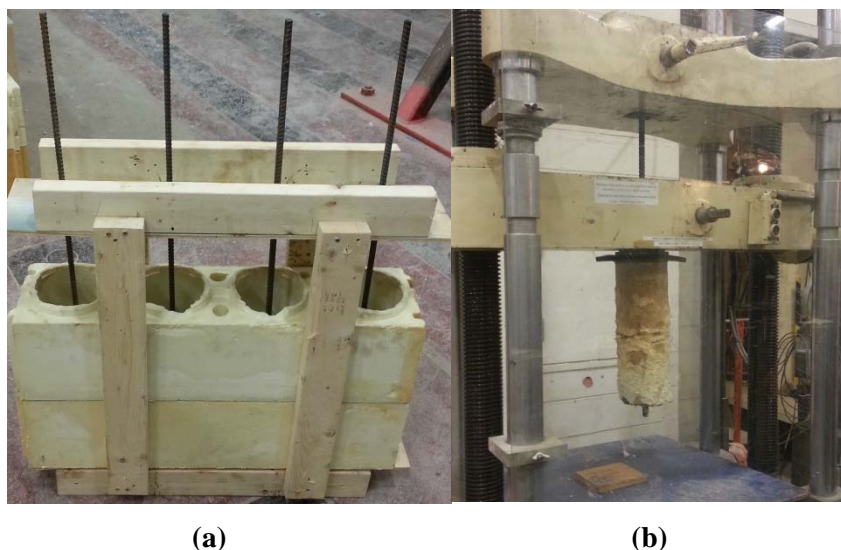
Pull-out test arrangements a) Pull-out test formwork, b) test set-up
